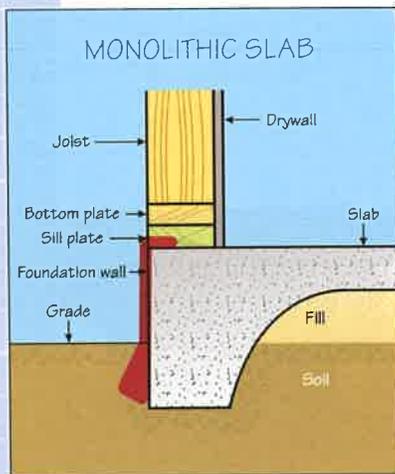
Typical termite access (marked in red) in a monolithic slab.
